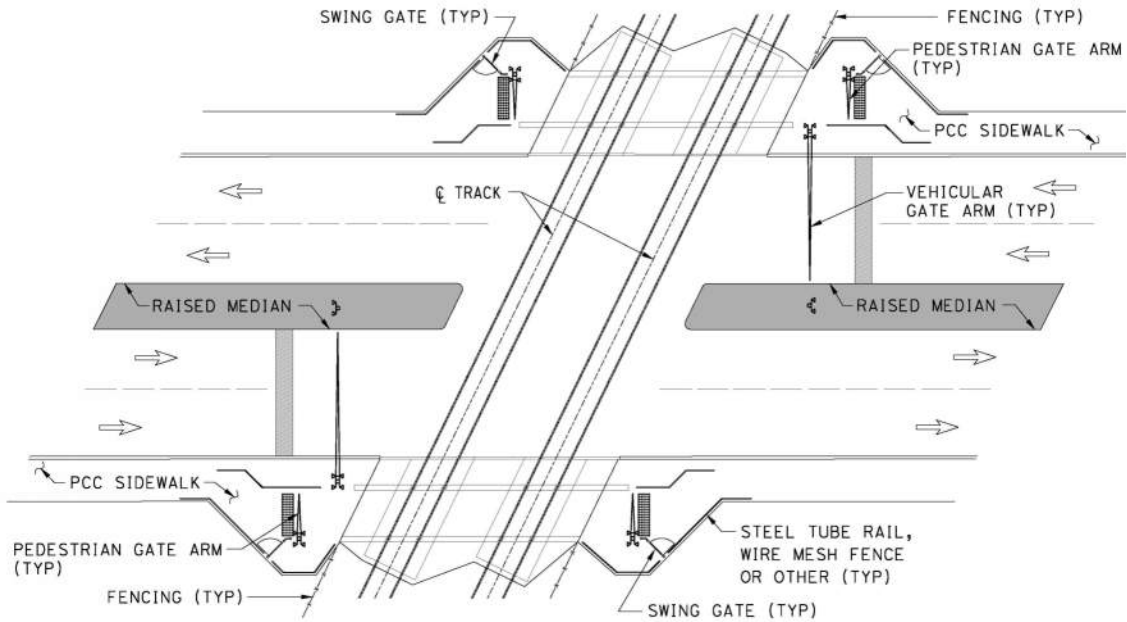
Skewed Highway-Rail Grade Crossing (Right)
